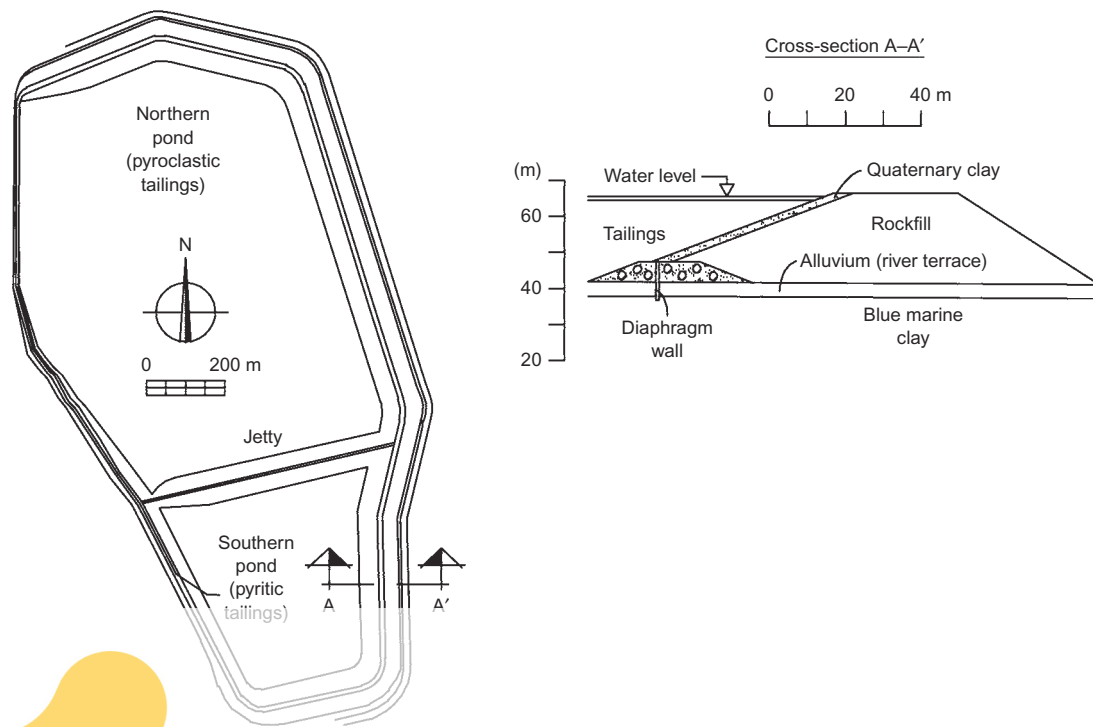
Plan view of Aznalcóllar tailings deposit and representative cross-section of failed dam
